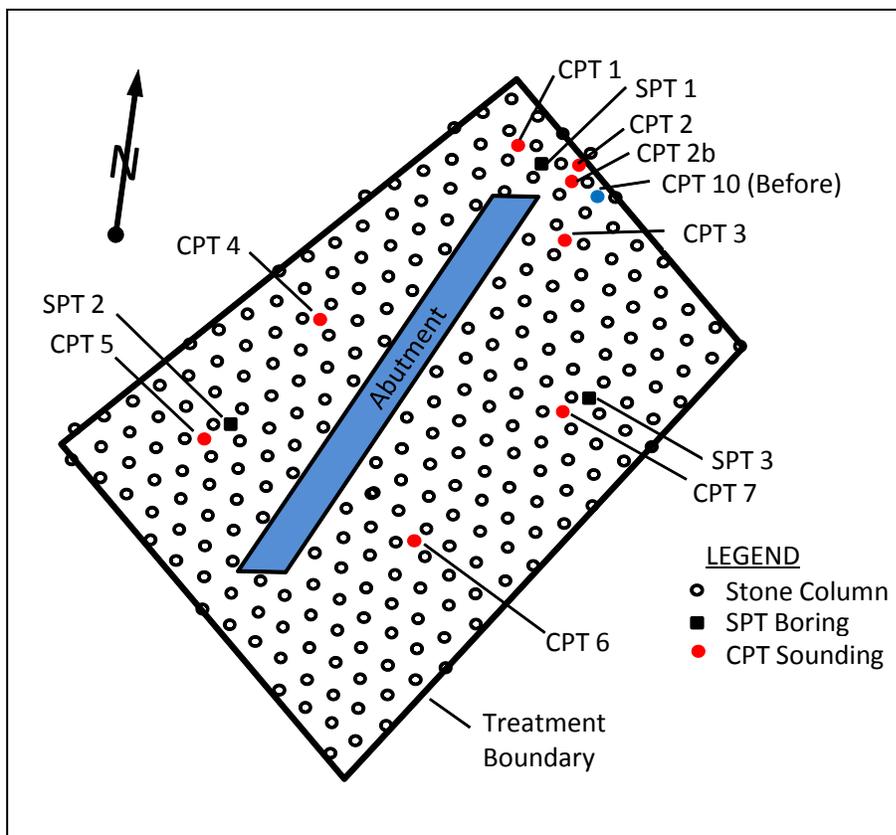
Layout of SPT and CPT holes relative to the stone columns at east abutment.
